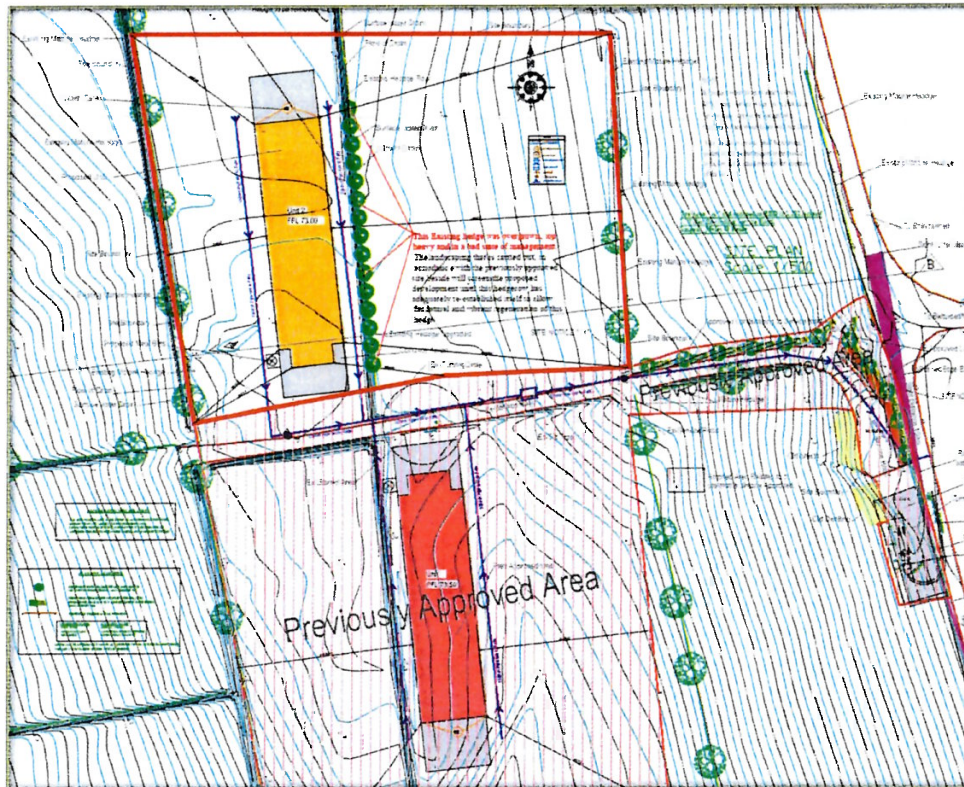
Proposed Site Plan (Prepared by M O'Reilly Civil Engineering)
